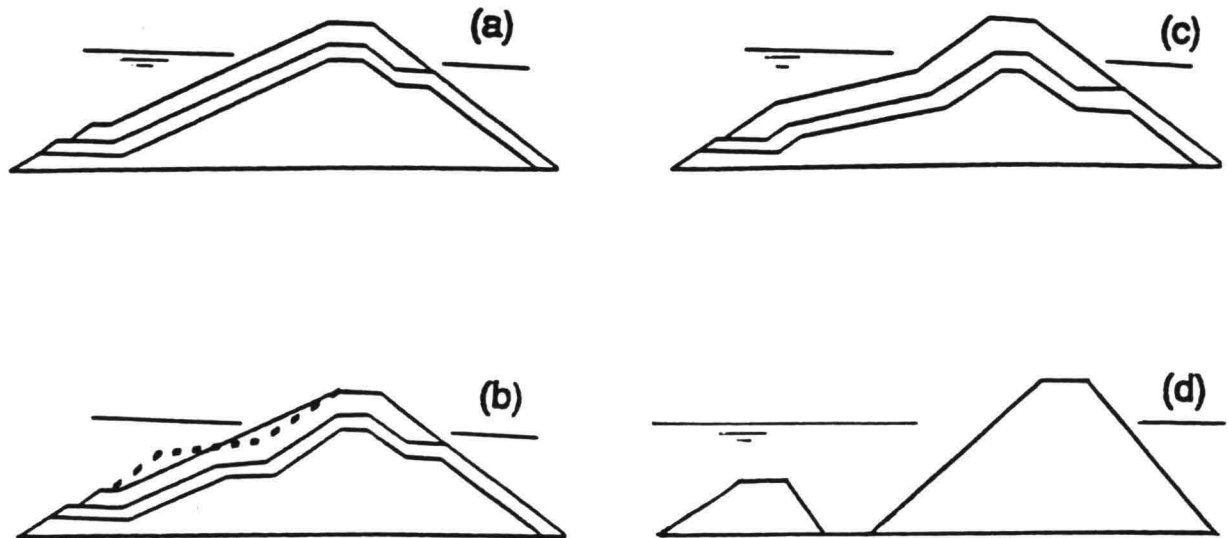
Rubble mound breakwater cross-sections: a) Conventional; b) D-armour; c) S-shaped; d) Tandem.
